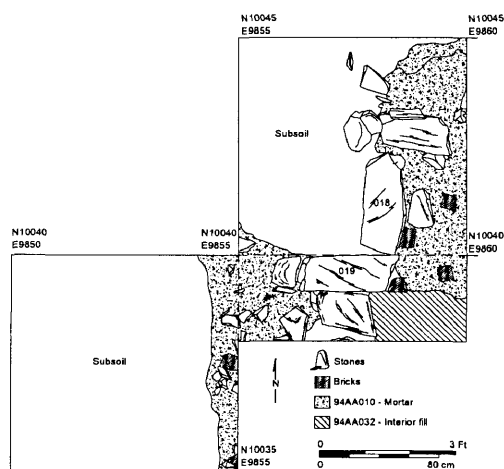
Plan view of west end stone chimney base (C. Alblinger, CWF).
